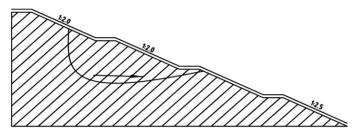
potential sliding surface of expansive soil slope in demonstration section
